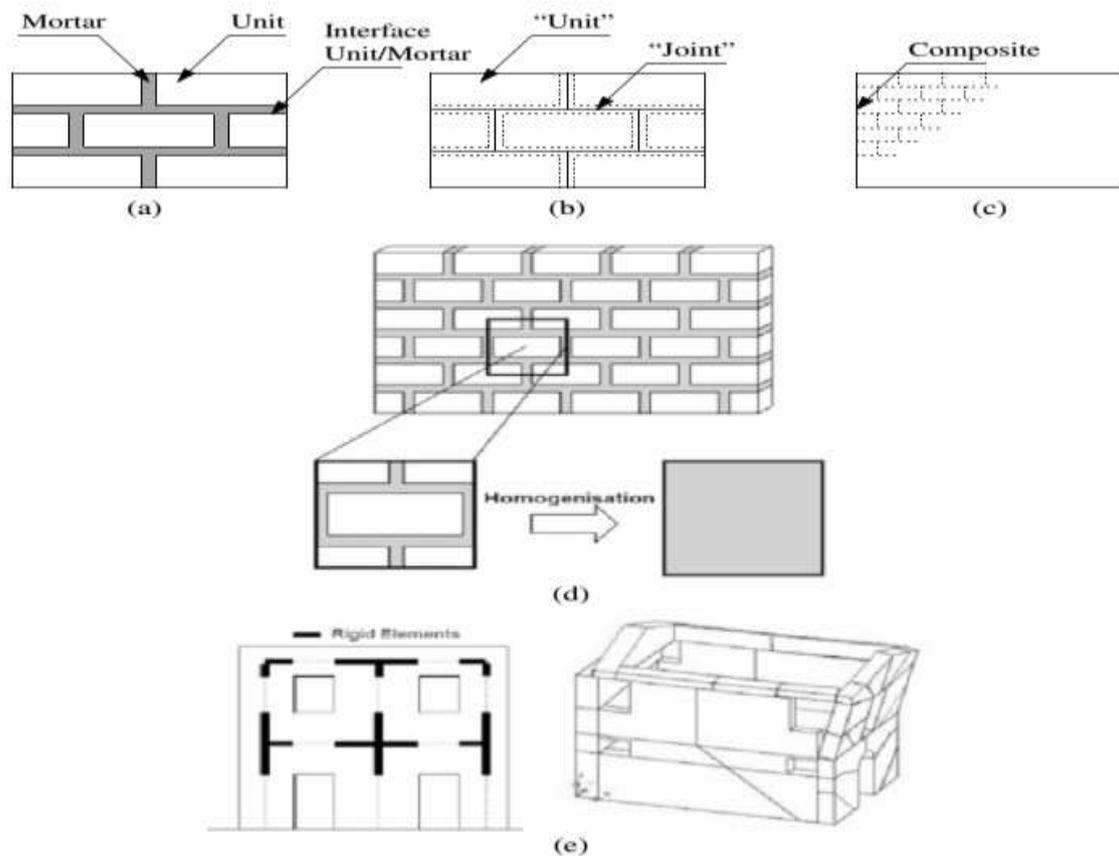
Modelling approaches for masonry: (a) representation of regular staggered or running bond masonry; (b) micro-modelling; (c) macro-modelling; (d) homogenization; (e) illustrative structural component models, with beam elements or macro-block.
